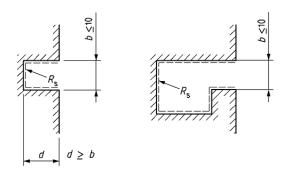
Examples for slightly ventilated cavities and grooves with small cross section
